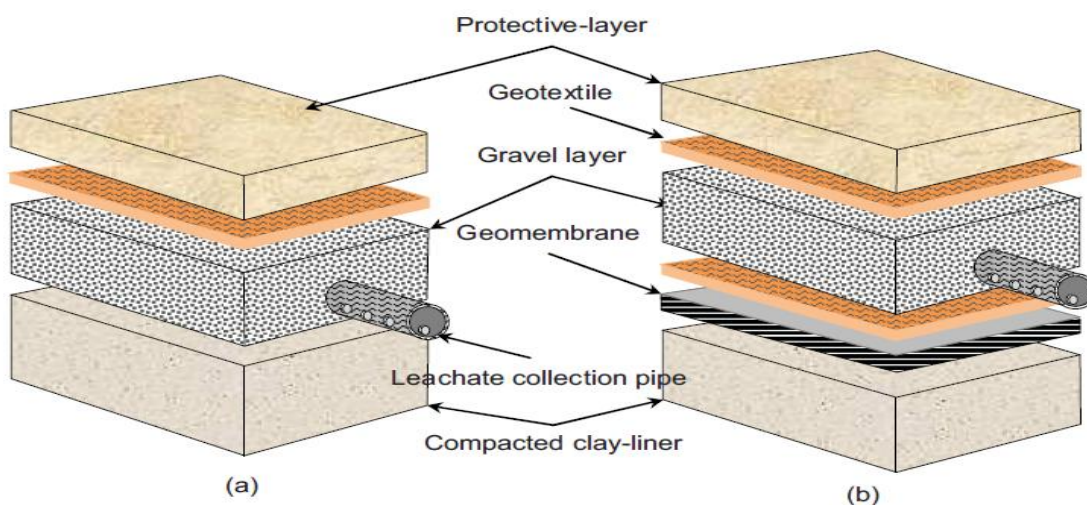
Typical layout of: (a) single lining system (b) double lining system
